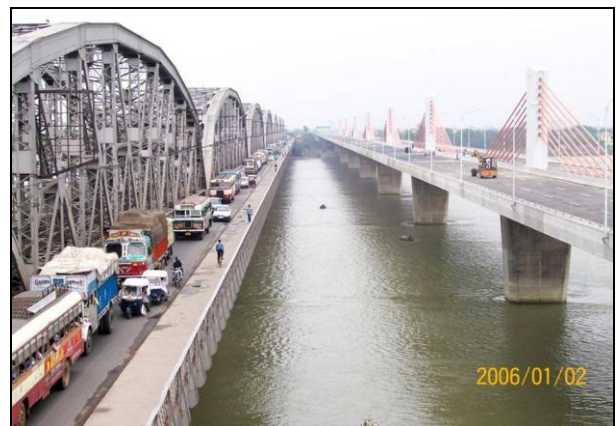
Second Vivekananda Bridge - 50m downstream of Bali Bridge
